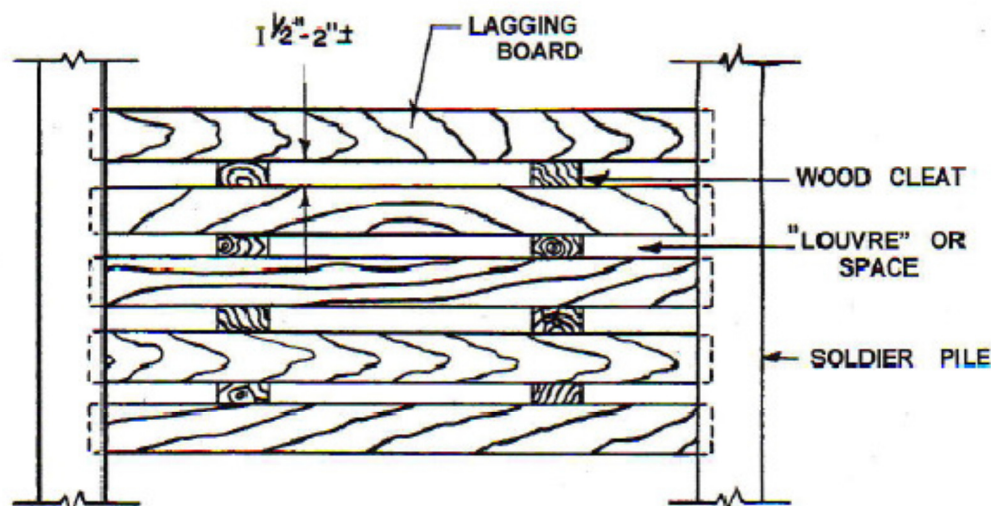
Elevation view of lagging members (Figure from FHWA Publication)
